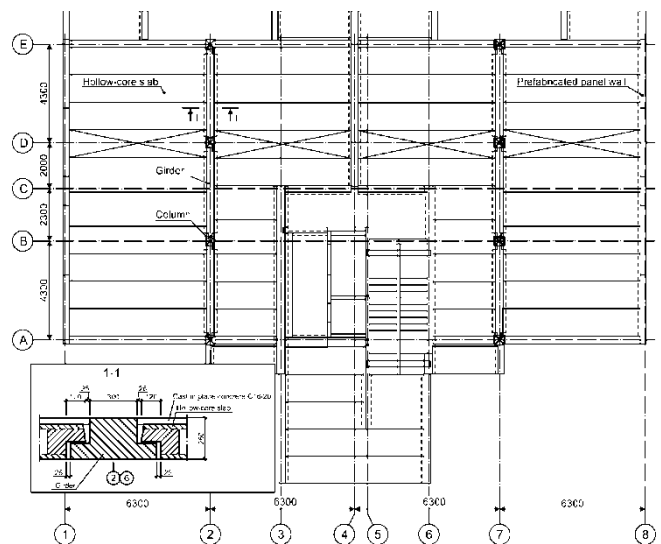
The first floor of an analyzed 18-storey precast framed building.
